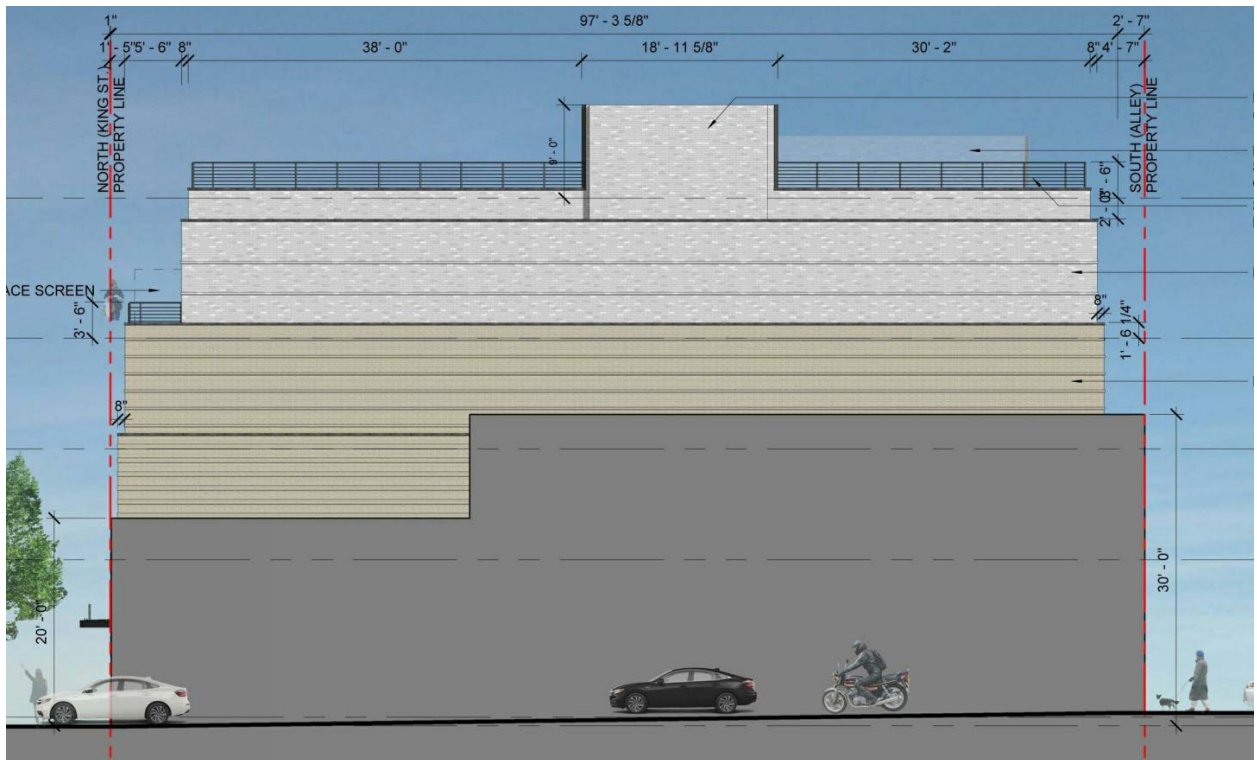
West elevation from South Patrick Street with the existing 924 King shown in grey.
